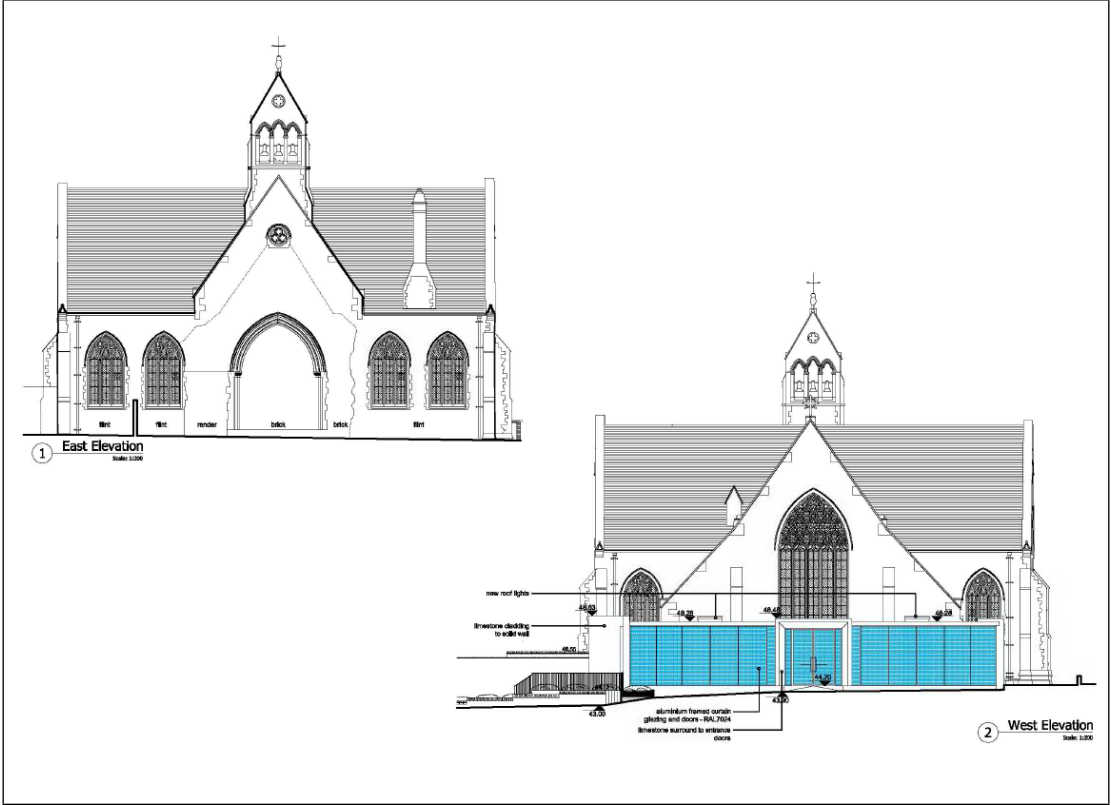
Proposed elevations (Greyfriars Church, East & West)
